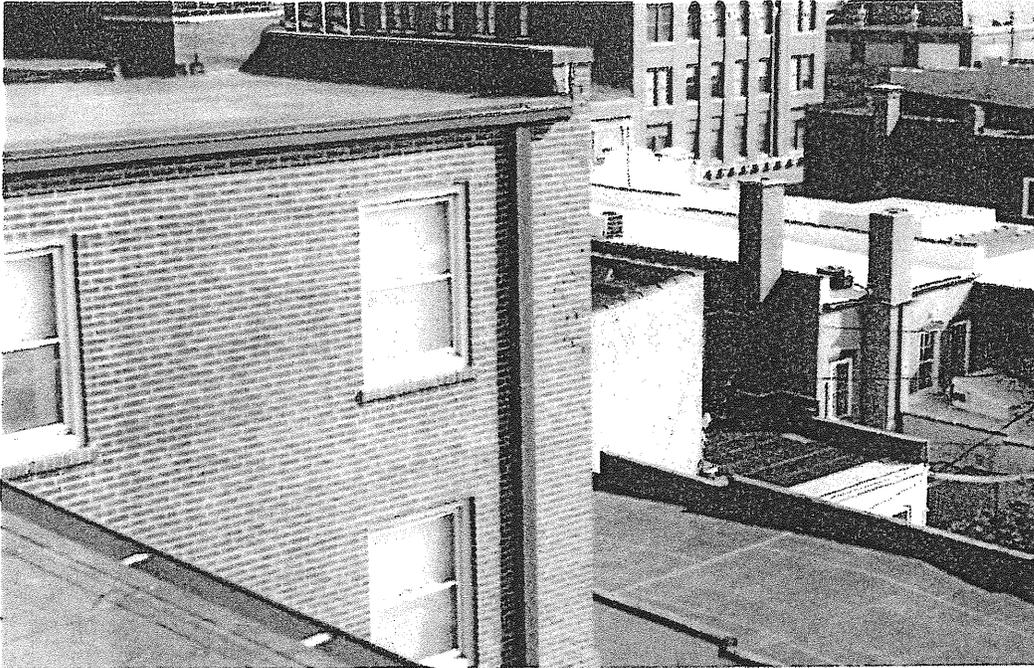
Southeast Corner of Upper Roof. Note, masonry distress at parapet and sixth floor wall at corner.
